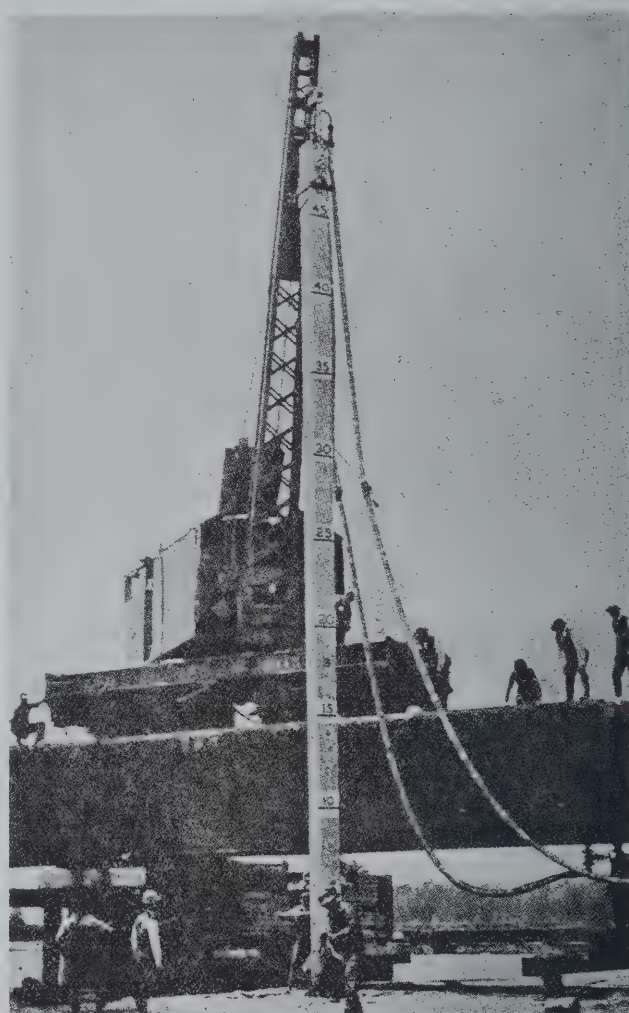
GETTING CONCRETE PILES INTO GROUND.
